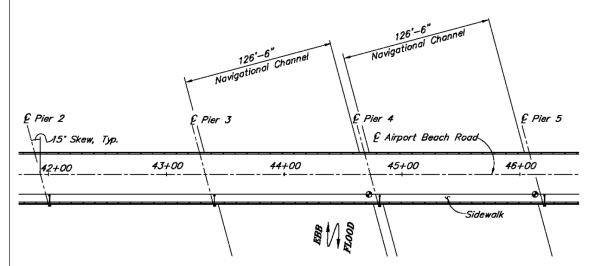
Bridge plan view indicating multiple navigation channel width dimensions to substructure units in the waterway. (Source: Alaska DOT)
